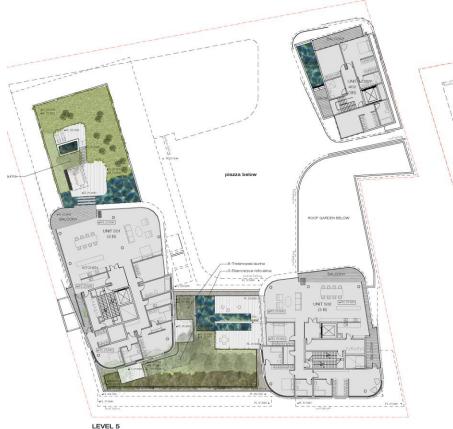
Level 5 roof terraces Source: McGregor + Partners Landscape Architects
